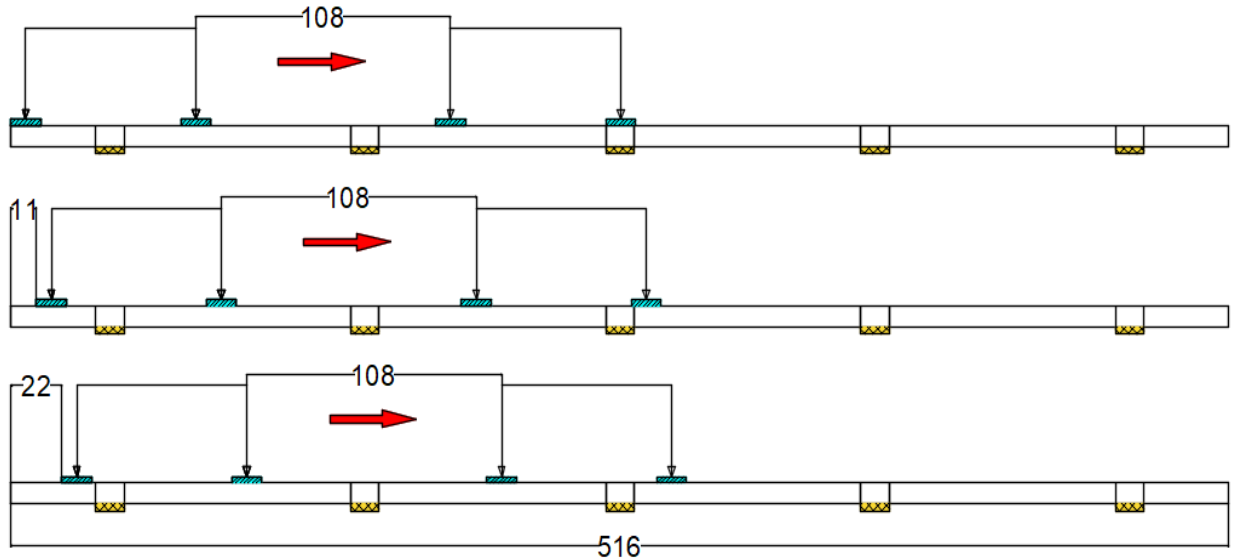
The placement of two HL-93 truck load on the deck slab with 9 ft girder spacing (first three combinations of Case 4, unit: in)
